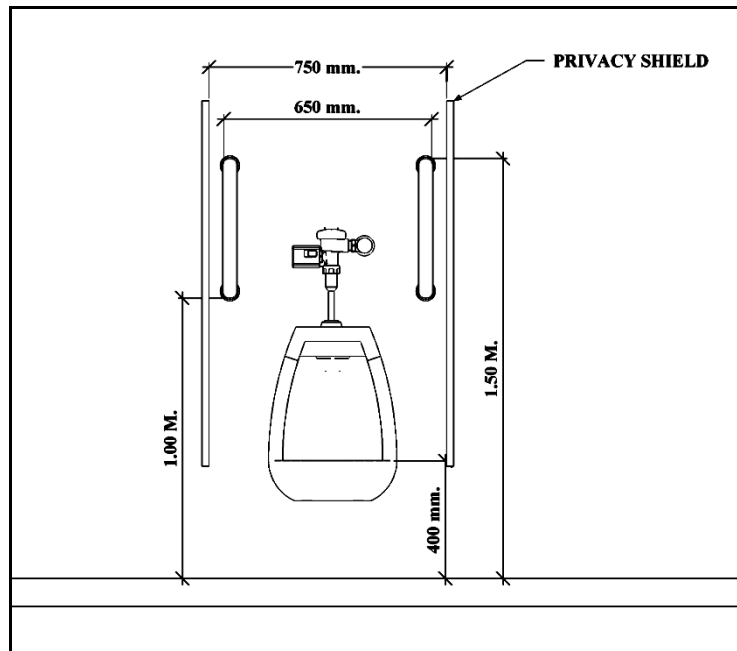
ACCESSIBLE URINAL (FRONT ELEVATION)
